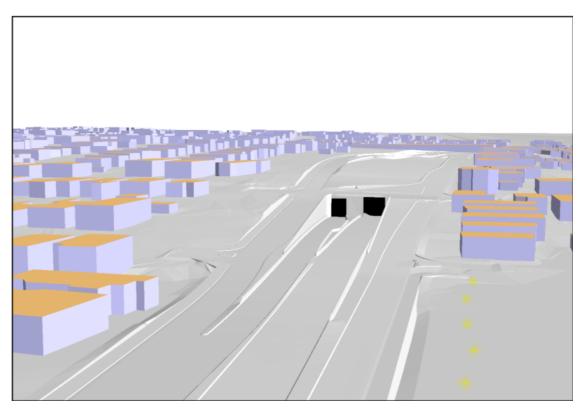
EIS Wattle Street interchange (oblique elevation, facing south)
